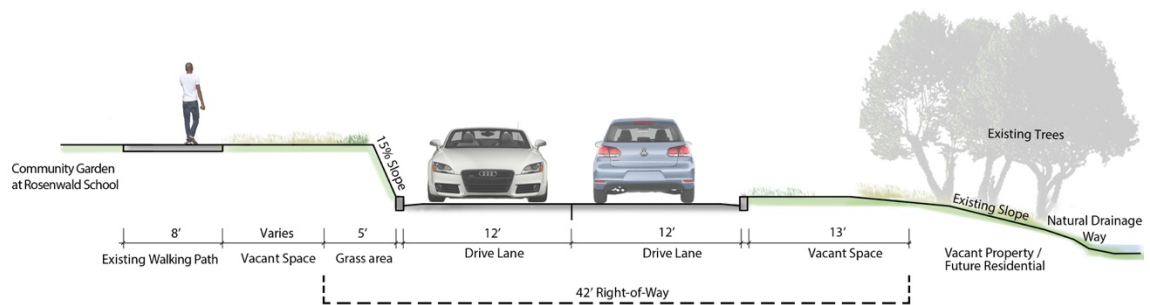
Section D-D – Existing Street Cross Section 2 (By author)
